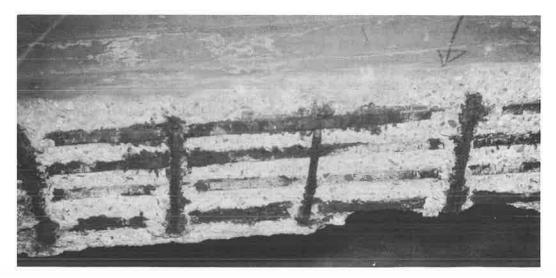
Spalling of concrete in beam caused by corrosion of reinforcing steel, San Francisco-Oakland Bay Bridge, 1962.
